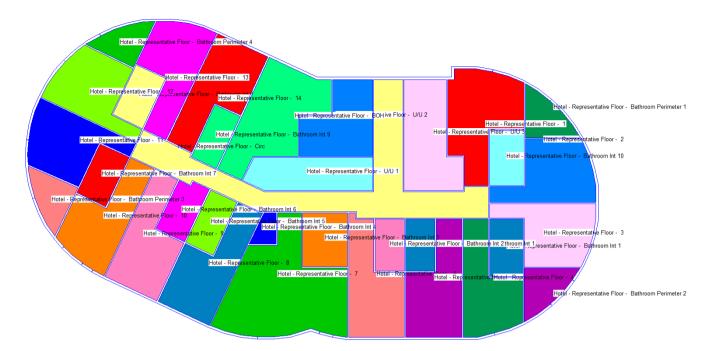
Typical Hotel Floor - HVAC Zoning
